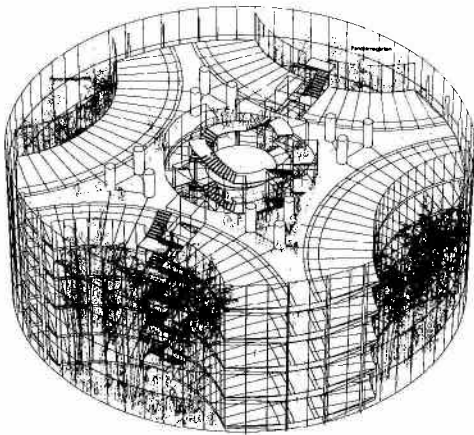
Isometric of part of tower showing central core and cross shaped plan of interior
